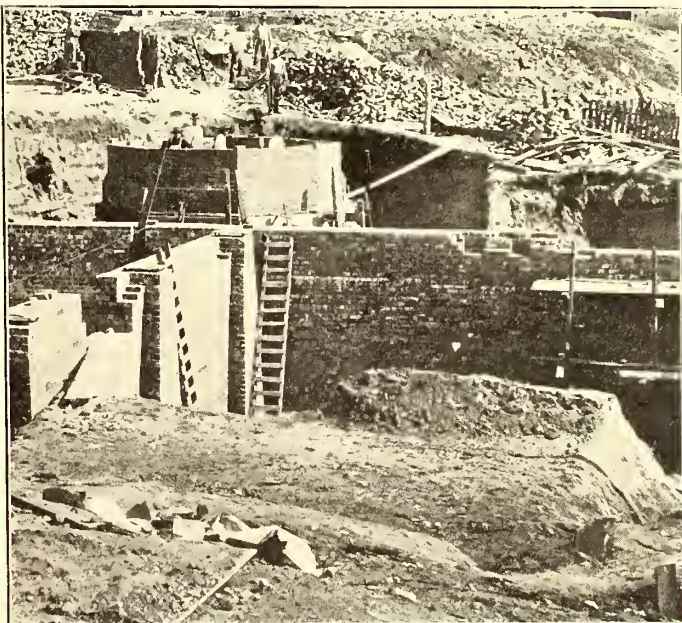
FOUNDATION WALLS FOR NEW STATION
